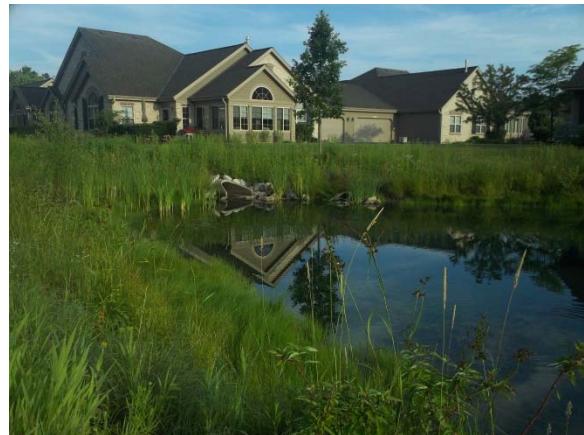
Overview of the two Outfalls on the West Portion of the Pond
